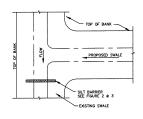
SILT BARRIER AT CONNECTION OF SWALE TO EXISTING SWALE
